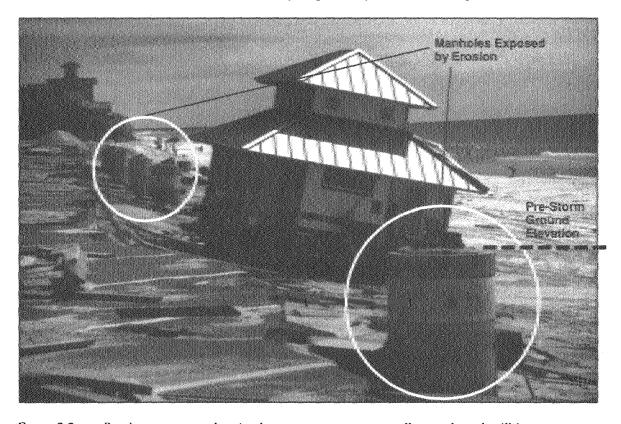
Beach erosion caused major damage to structures, as well as roads and utilities.
